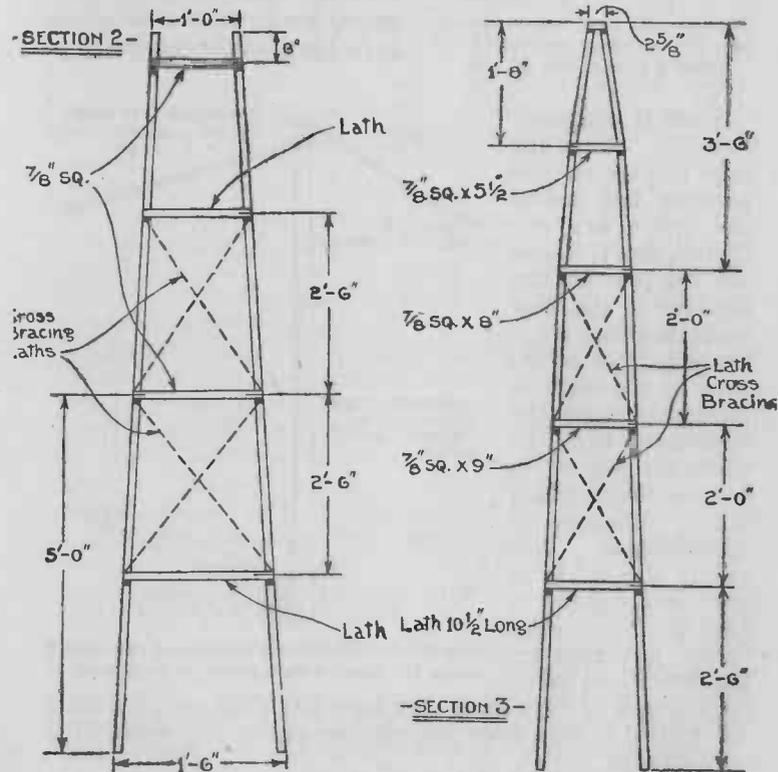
Showing the dimensions for building the second (middle) section of the mast.
